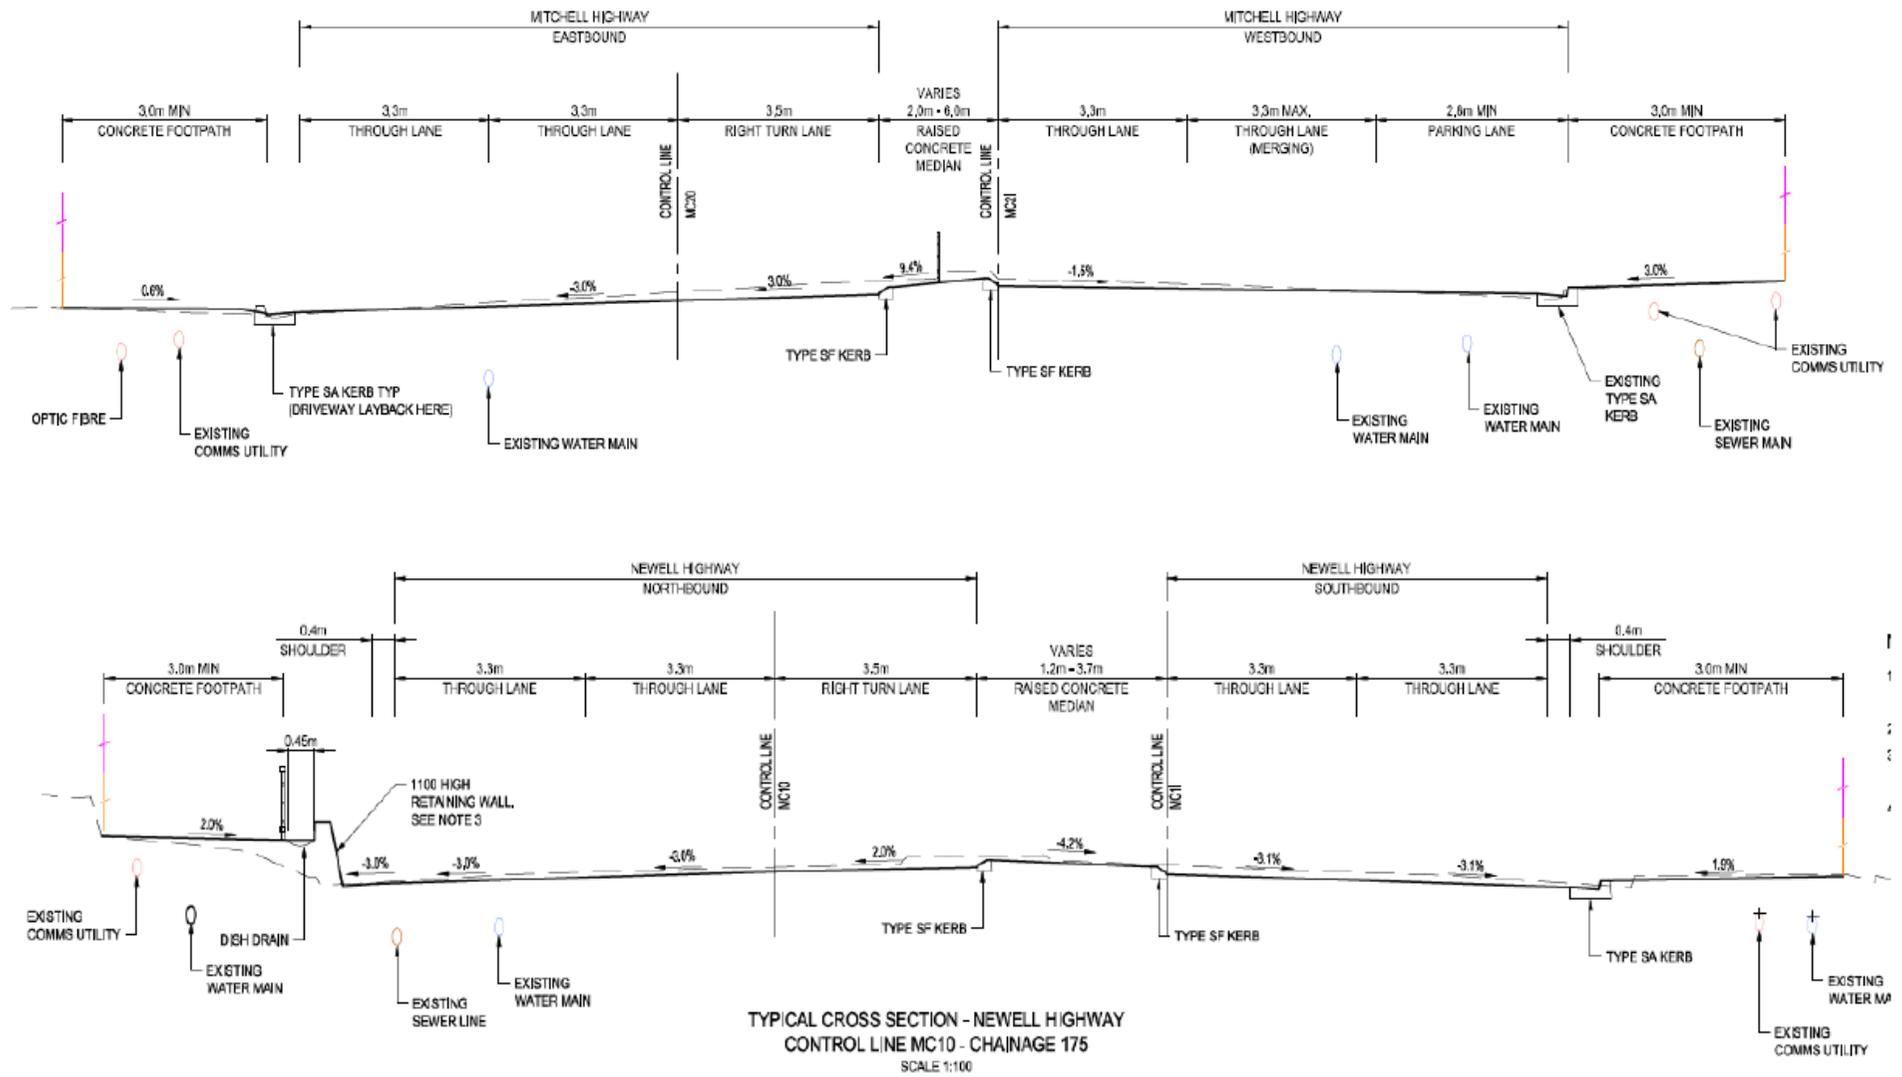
Typical cross sections of the Newell and Mitchell highways
